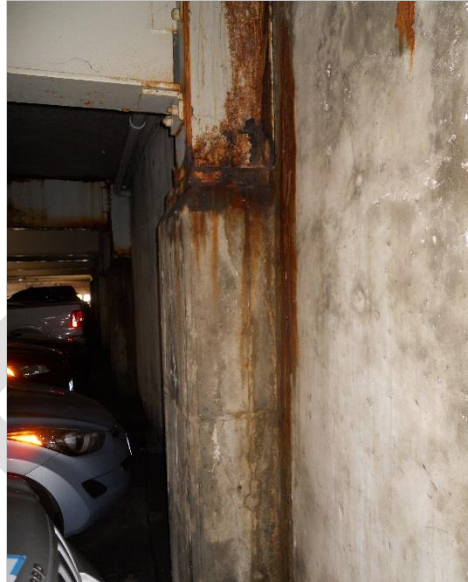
Level 2 - underside framing corrosion along expansion joint line. Note corrosion on FP line.
